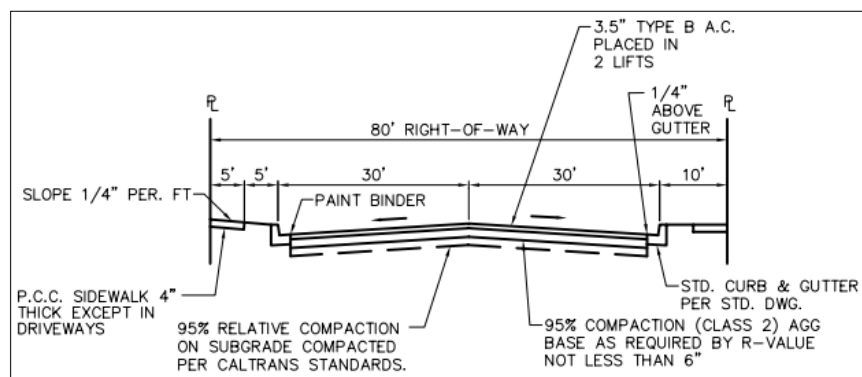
COLLECTOR STREET TYPICAL CROSS-SECTION
